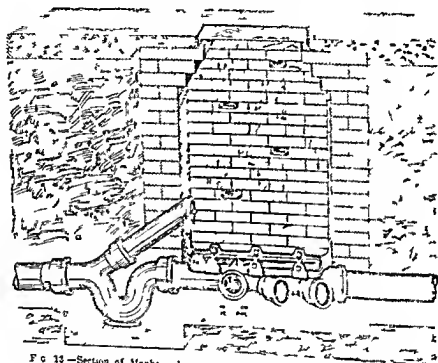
Section of Manhole showing combination of aspect of drainage pipe and manhole on drainage pipe.
